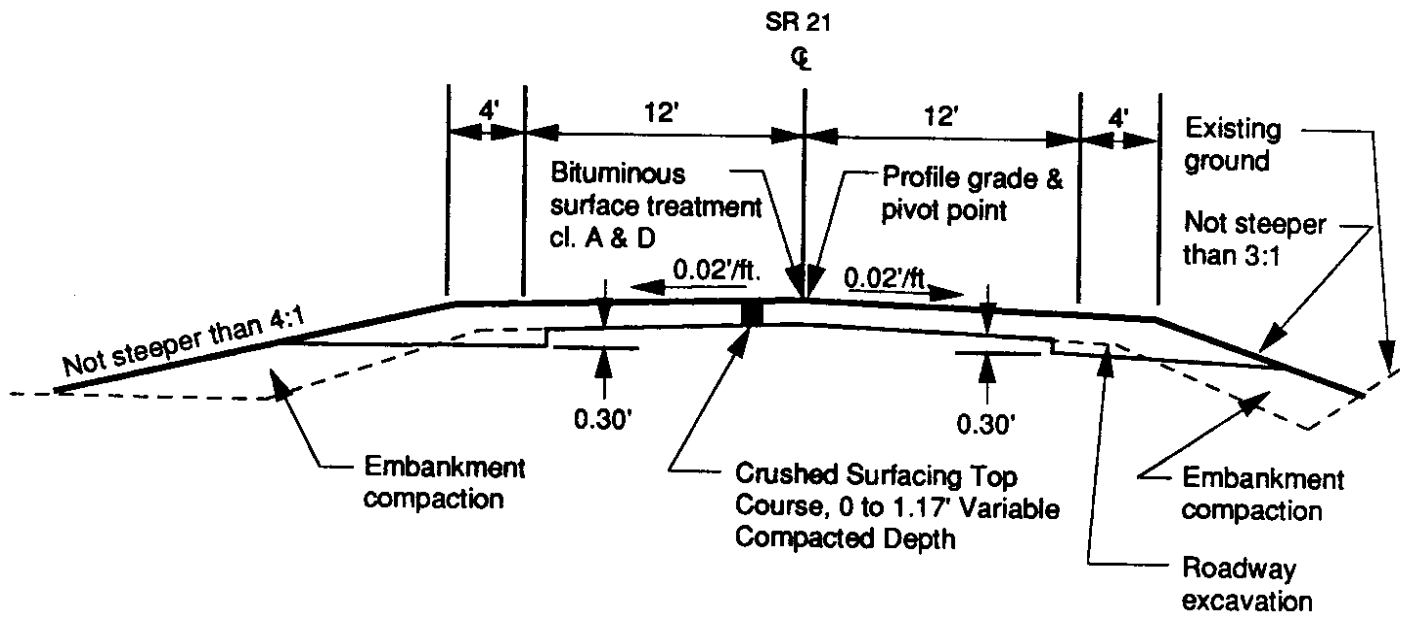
Roadway Cross-Section at Curlew Creek Bridge
